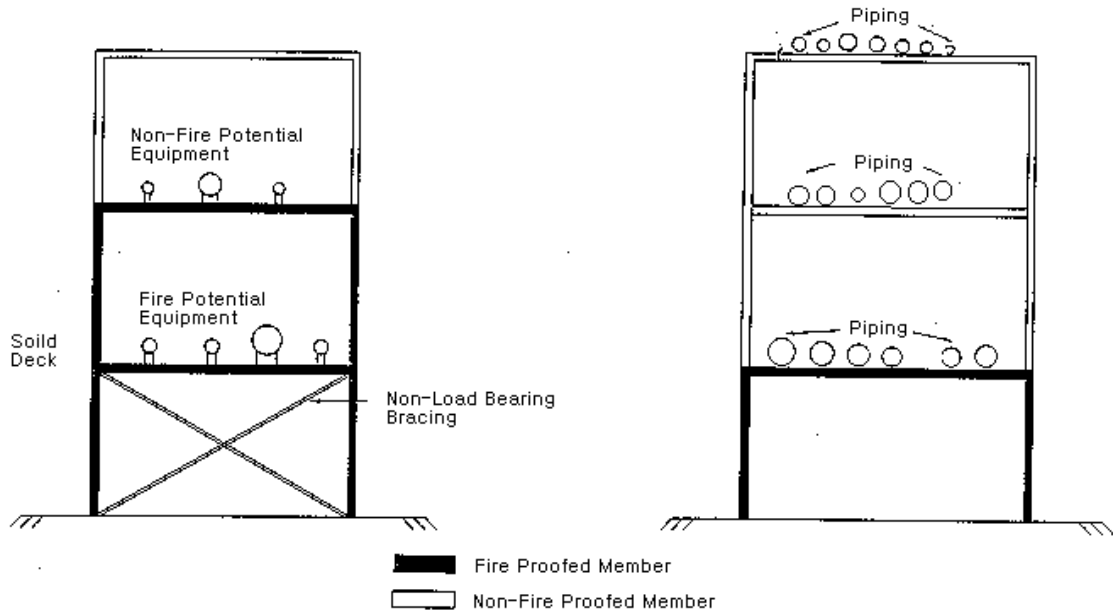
, Structure Supporting Equipment In Fire Exposed Area
